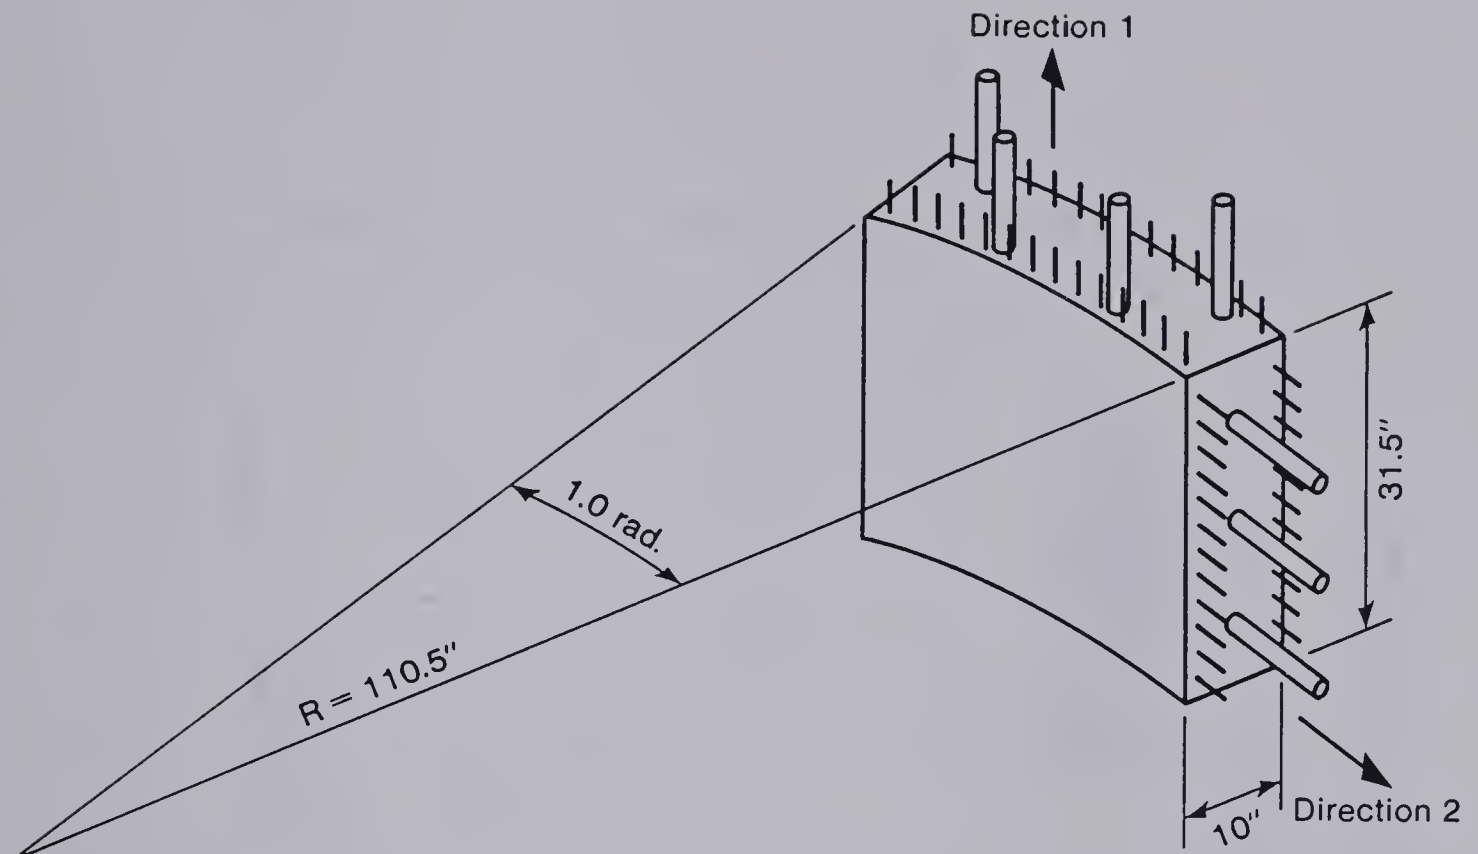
Axisymmetric Modelling of Wall Segment Specimen
